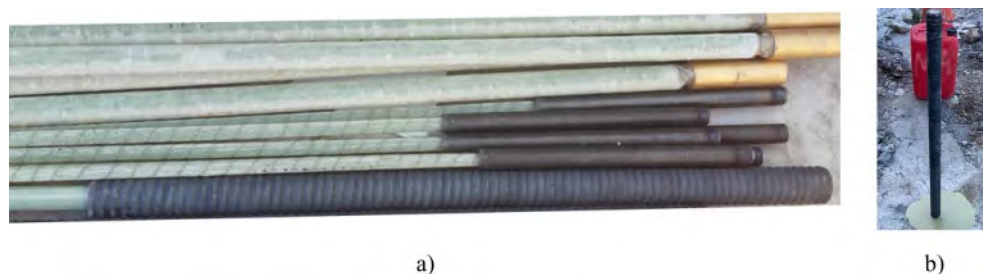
a) Threaded steel tube glued on the GFRP bars with epoxy resin; b) *Silicajet EXP/4* grouted *Glasspre* GFRP bar with threaded steel tube glued externally in CB limestone.
